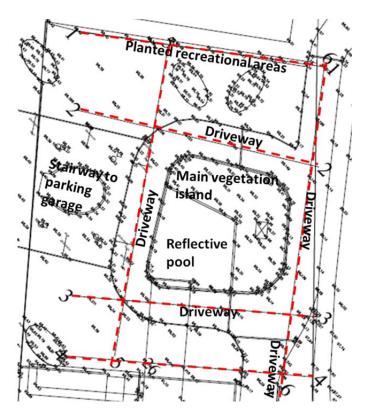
Elevation survey performed 36 months after completion of the construction of the flat roof
